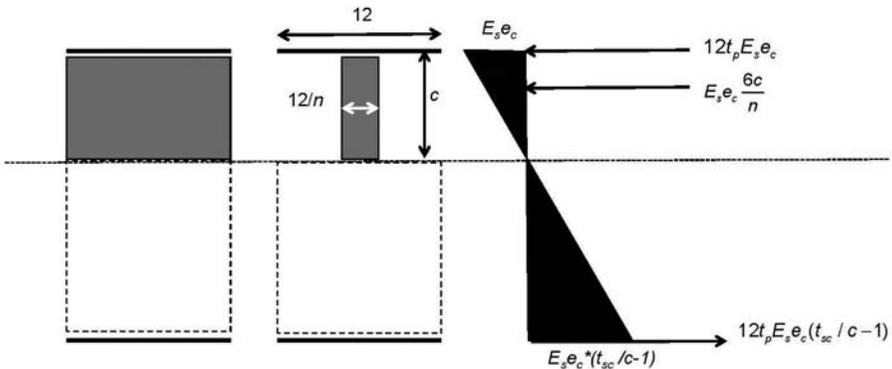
Flexural stiffness of cracked-transformed section of SC walls.
